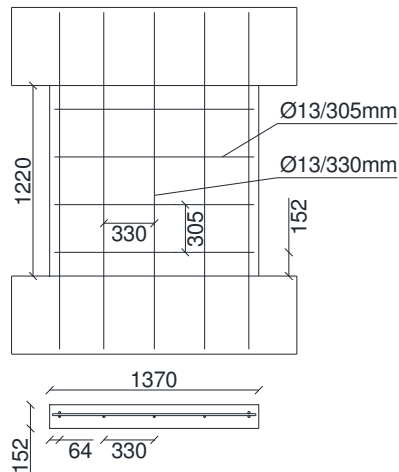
Steel reinforcement of wall WP-T5-N10-S2 (Orakcal et al., 2009) [mm].
